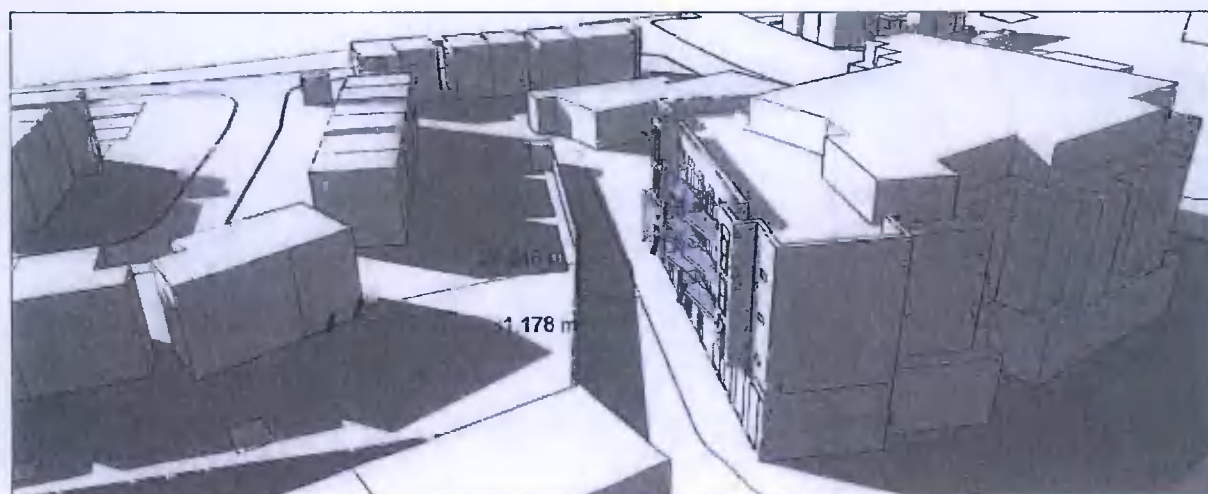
3D Study looking southwest and down laneway from Wheatfield Road.
